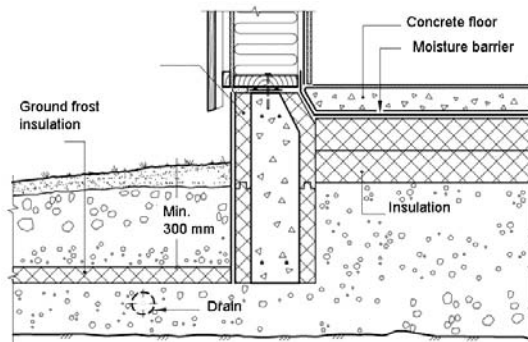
This figure shows how to avoid thermal bridging and air leakage at a wall / slab-on-ground junction.
